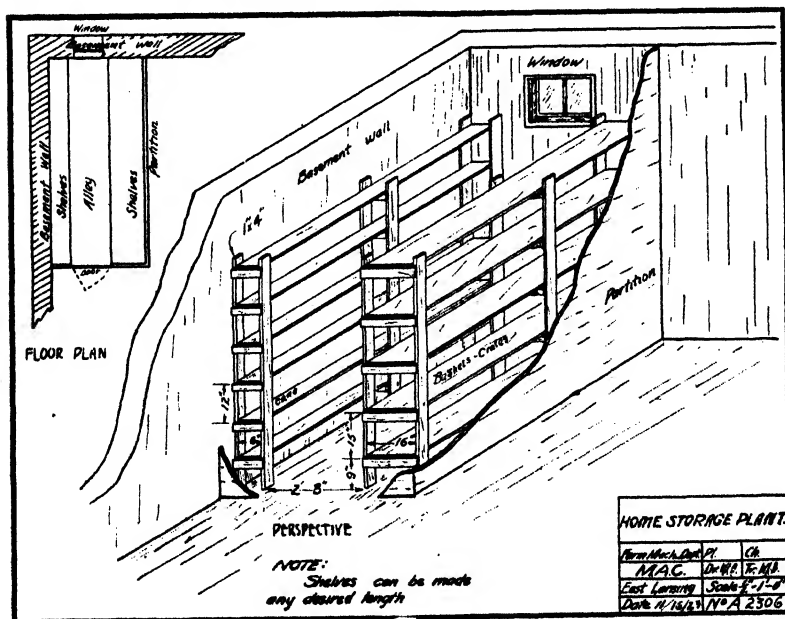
An outline drawing showing the general plan and type of construction of a good farm storage room.
